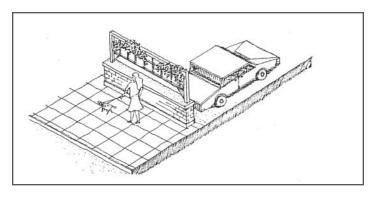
Surface parking screened by an architectural wall and trellis.
